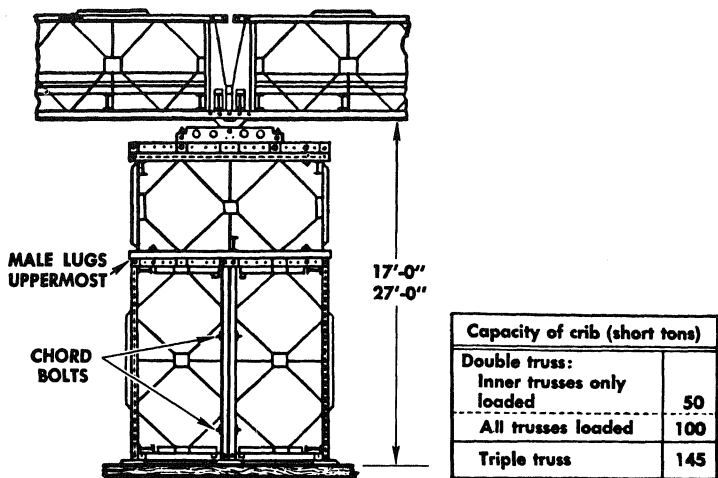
Bridge broken over crib. Double- to triple-story double-bay crib with panels both horizontal and vertical. Double bay of vertical panels in bottom stories.
